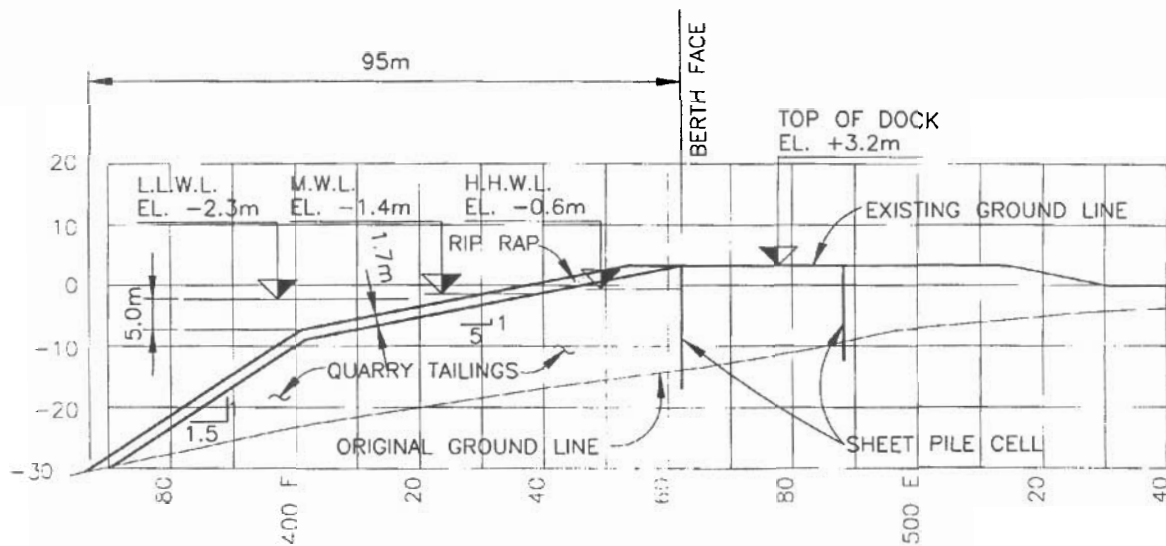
Cross-section through dock at Station 1400 N showing Option 2, to encase dock in rock (Scale 1:1,000).
